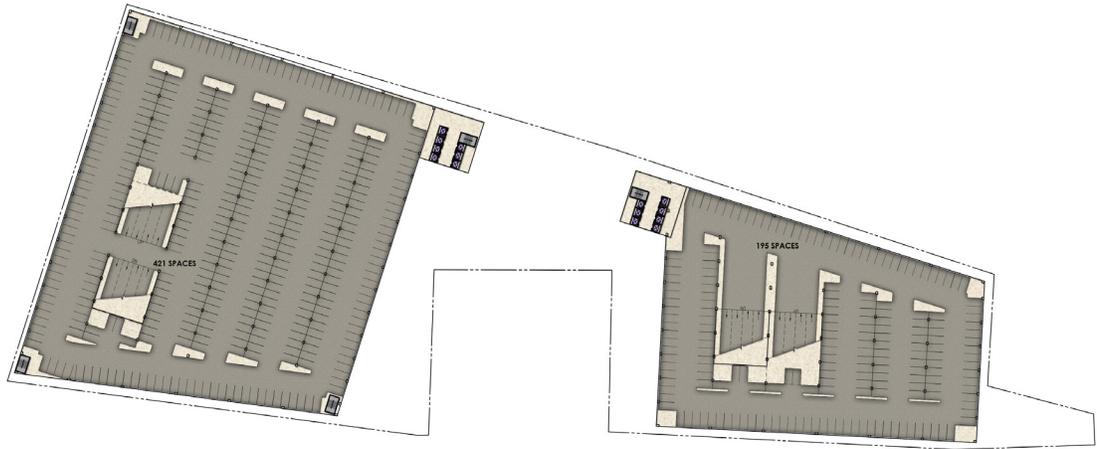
a-41 Alternate Parking Structure Plan - Garage Levels 3, 6, 9 Plan
